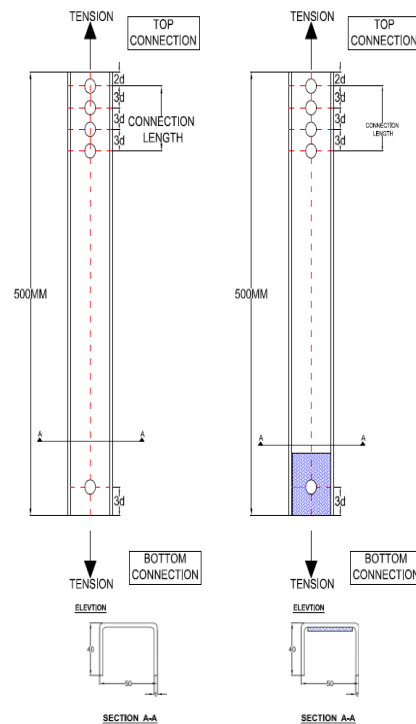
Channel moulds for the proper grip used for connecting channel section to UTM for Tensile test
